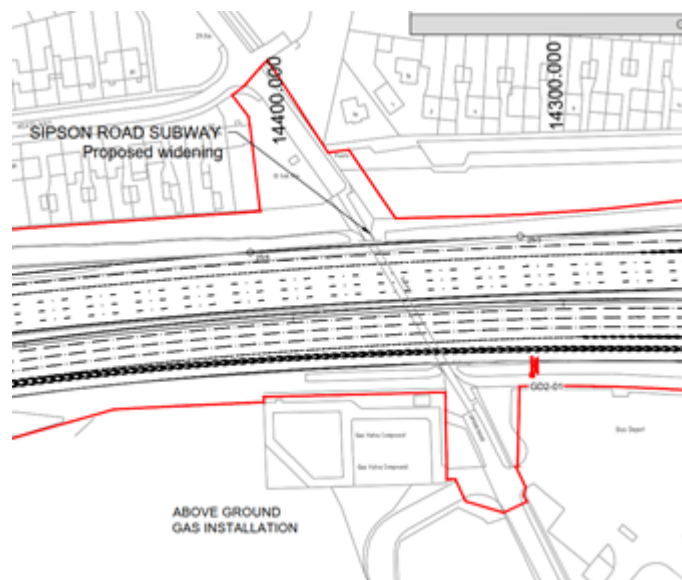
Extract of Engineering Design Sipson Road Subway North Widening Version C01 A, Issued for Construction Sipson Subway in GA drawing HA514451-CHHJ-HGN-SZ_MLZZZZZZ_Z-DR-CH-1088, 18/02/22
